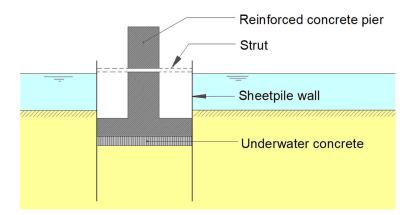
Cross-section of a cofferdam for a pier in a river
